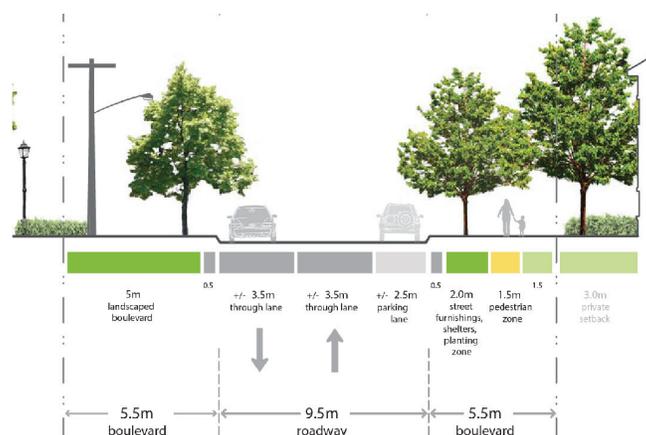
A : Proposed Welland Street Section – East Waterfront Secondary Plan.
